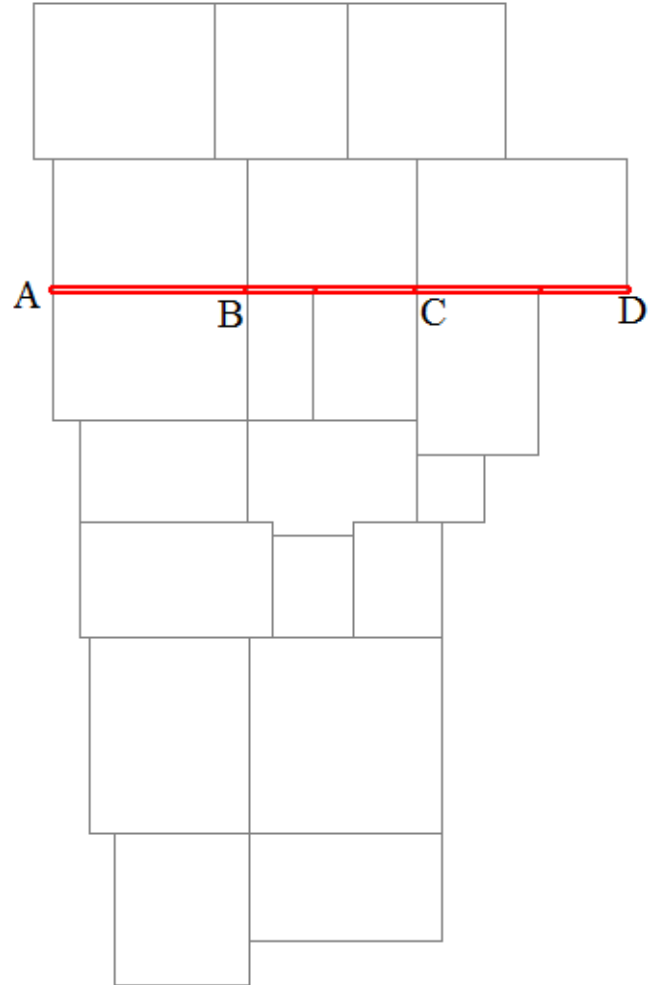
Beam position - STAAD Model (Ground Floor)
